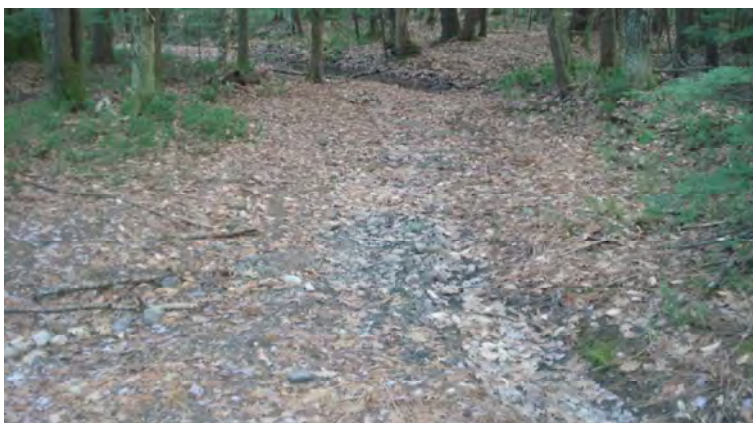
Black Brook Road, Proposed Sediment Trap (BMP 1)
